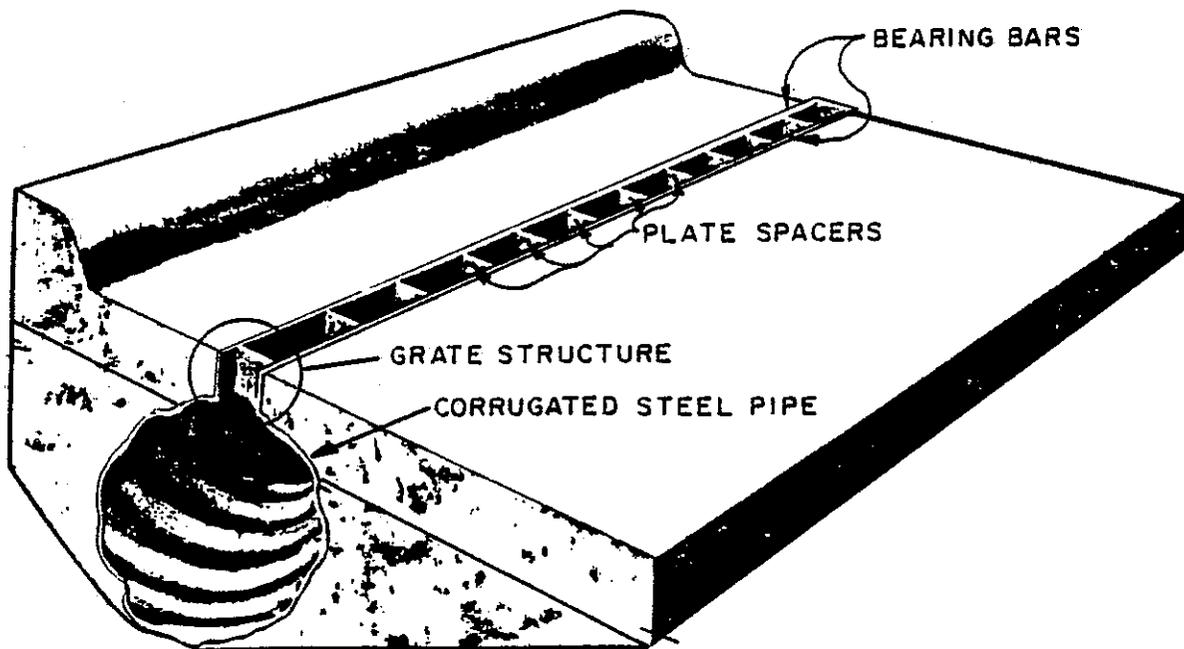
A SLOTTED CORRUGATED STEEL PIPE DRAIN
